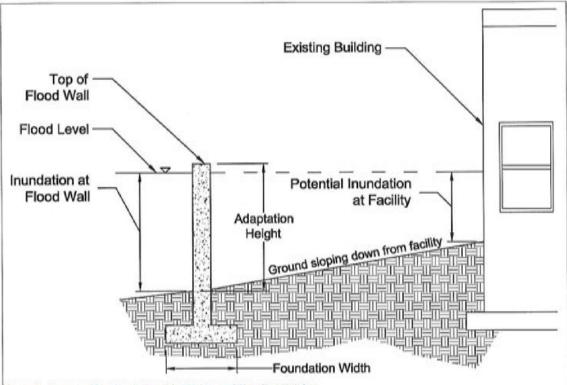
Cross-section Depicting Adaptation and Flooding Heights
